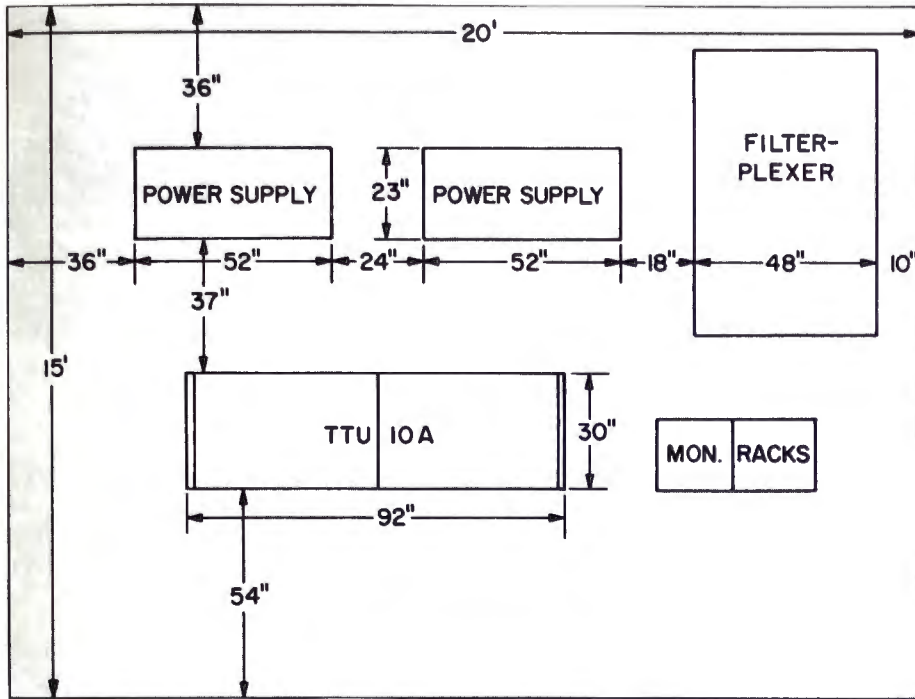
Typical floor plan layout of TTU-10A transmitter. Unitized power supplies can be located at any remote area.
